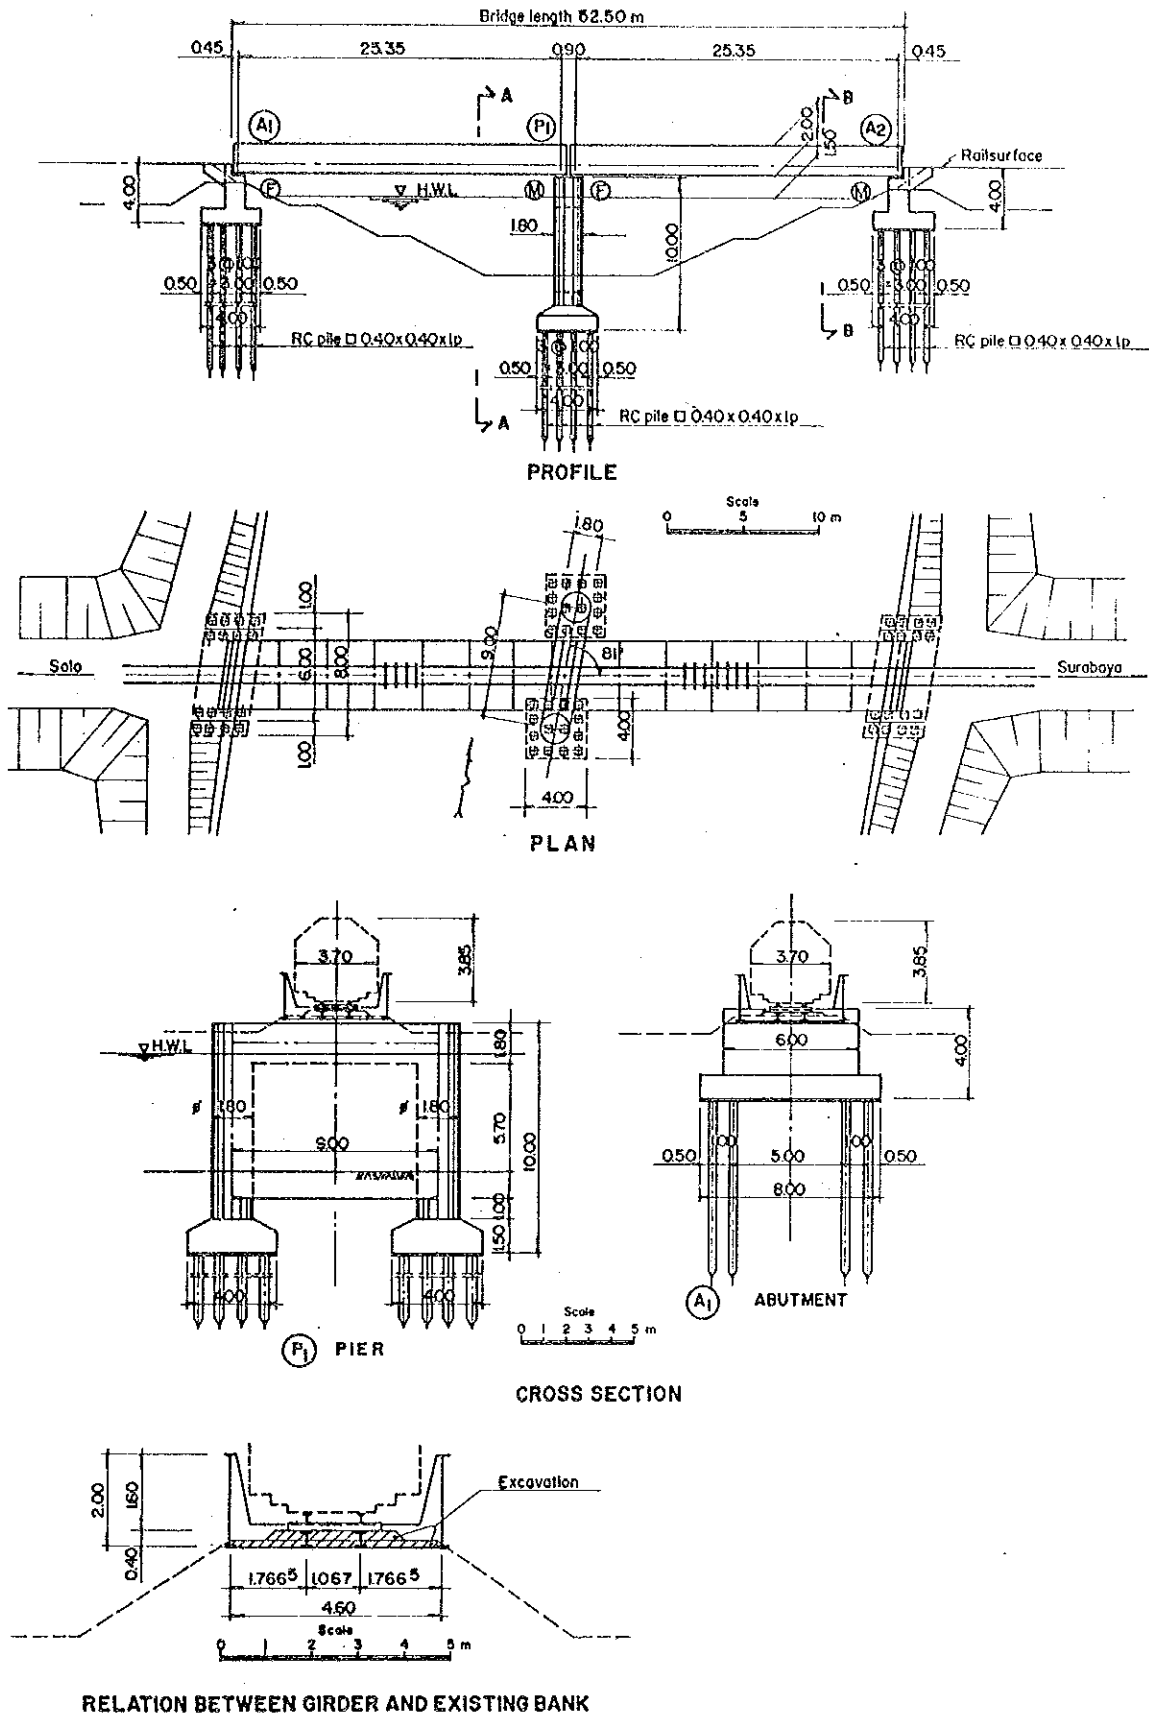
PROPOSED RAILWAY BRIDGE AT DIVERSION CHANNEL
